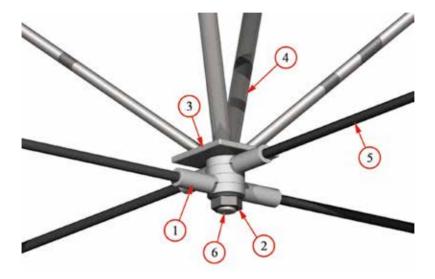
The nodal bolted connection: 1 - a connecting detail; 2 - a nut; 3 - a connecting plate; 4 - a diagonal; 5 - a bottom chord; 6 - a bolt
